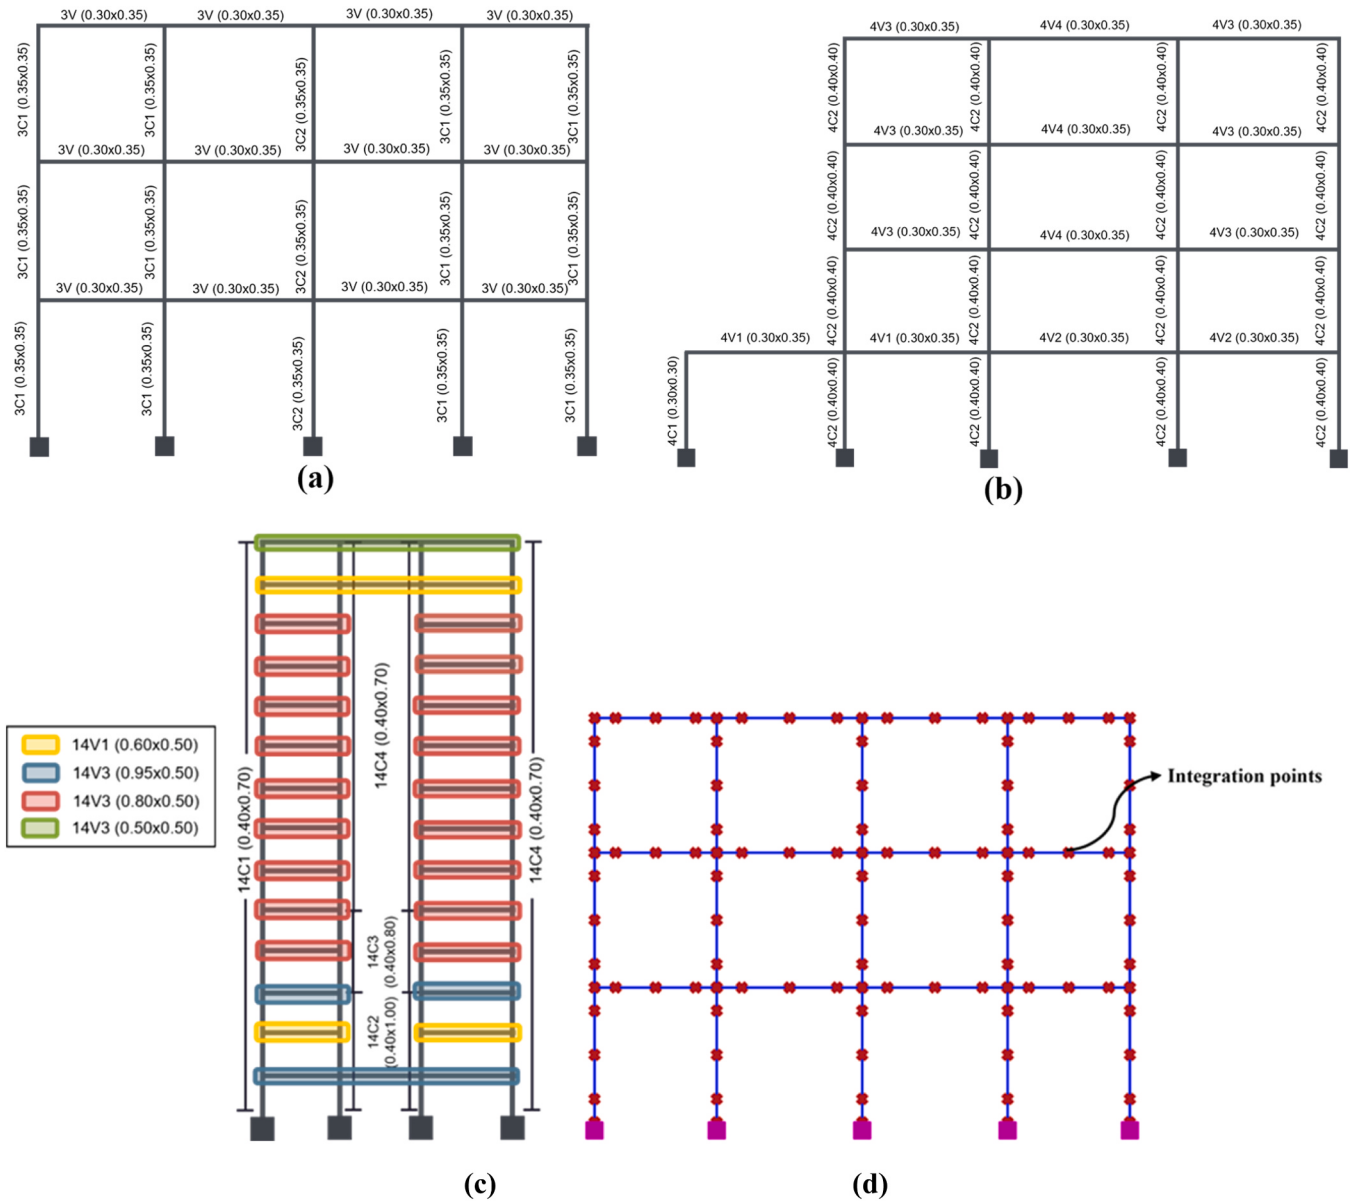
Beam and column cross-sections of the buildings: (a) 3 F, (b) 4 F, (c) 14 F, (d) Integration points of the fiber elements for the 3 F building.
